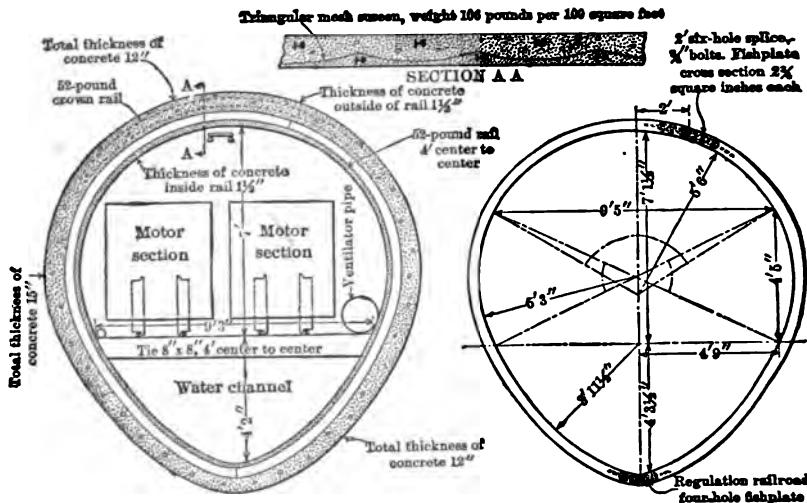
Reinforced concrete lining at Snake Creek tunnel.
